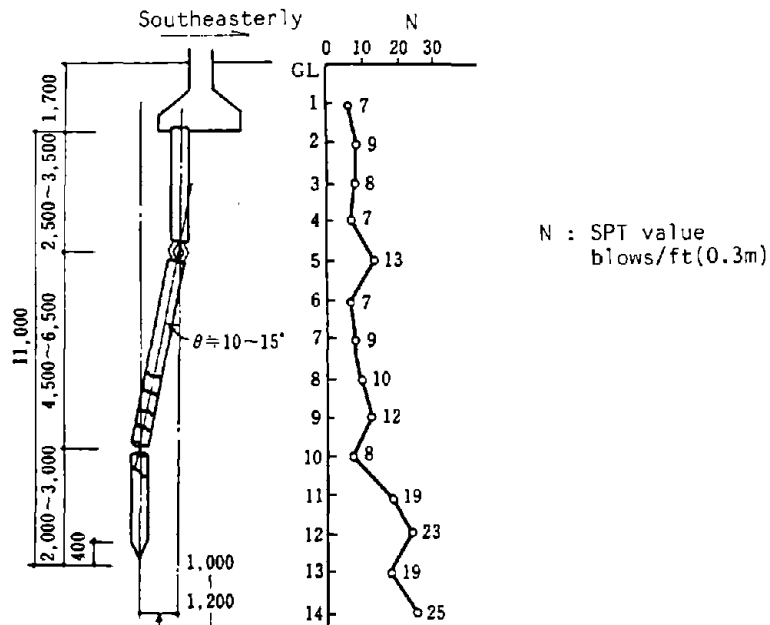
Damage to Foundation Piles of the NHK-Building
